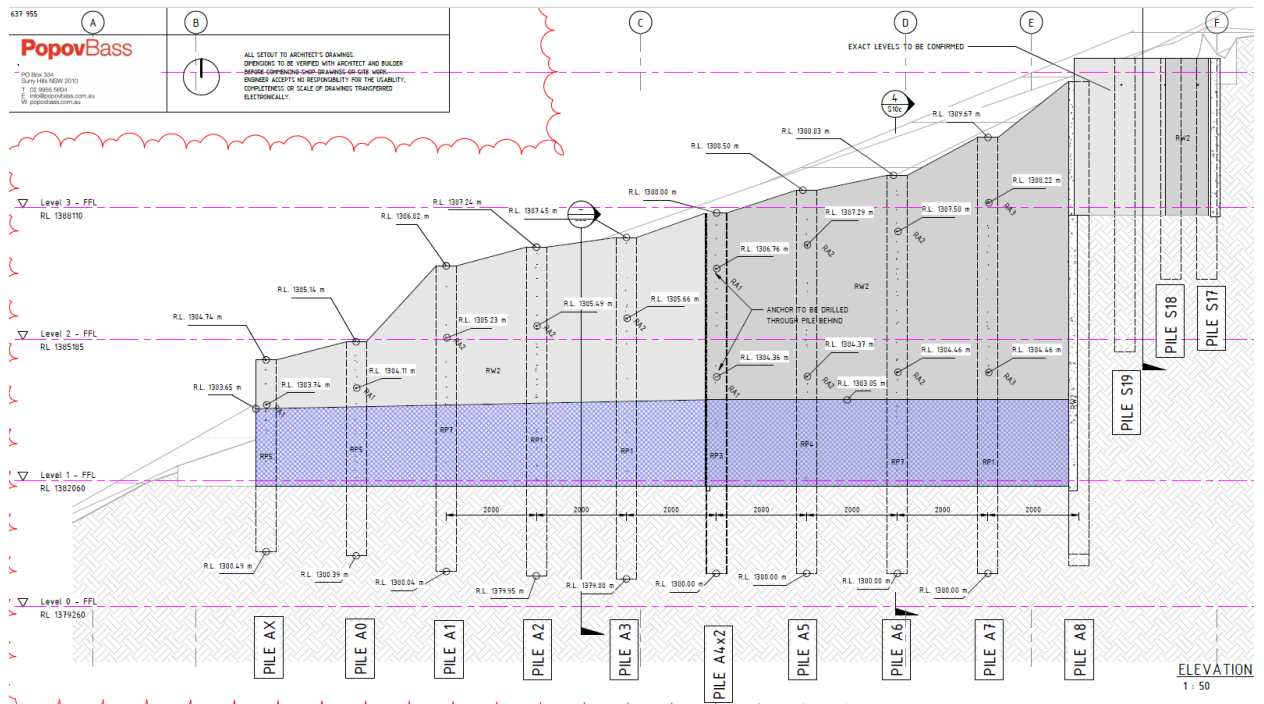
| Extent of temporary ground anchors, installed along boundary adjacent to Candlelight Lodge (Source: Applicant's documentation)
